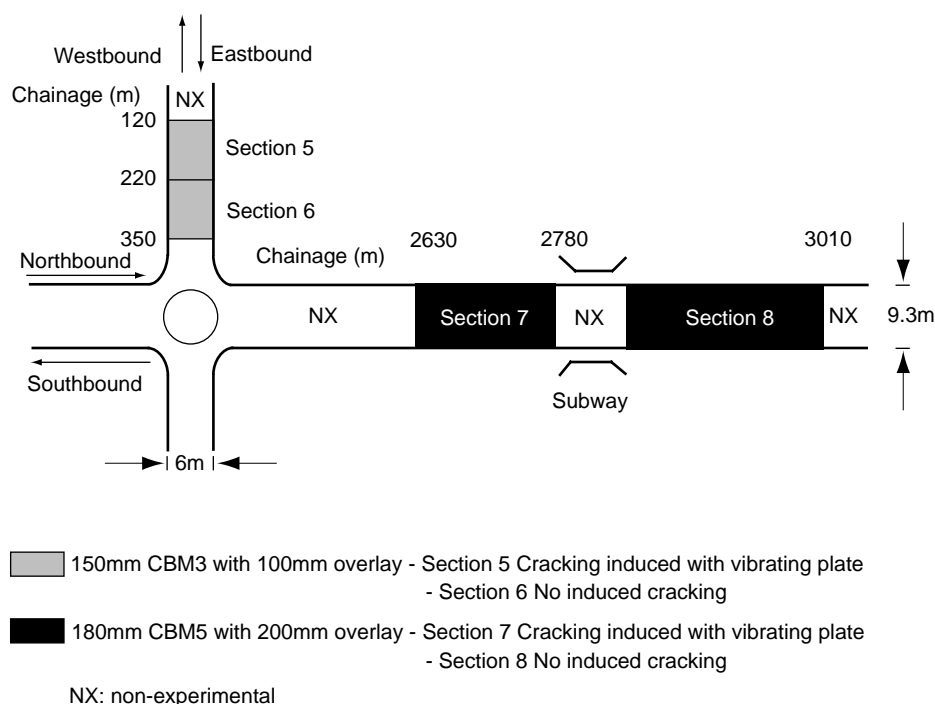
A605 Warmington Bypass schematic layout of trial sections
